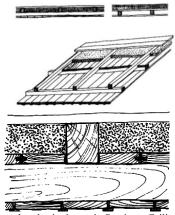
Oriental-style city house in Sarajevo. Ceiling construction Source: Author (Drowings, 2016.)
